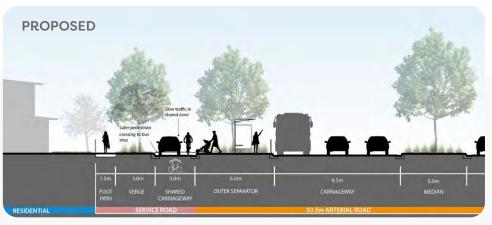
An example of a reconfigured service road, that could be utilised at key locations where pedestrian crossing movement should be prioritised - this example would provide traffic calming through a narrowed pavement, kerb outstands, line marking, and increased pedestrian activity.
